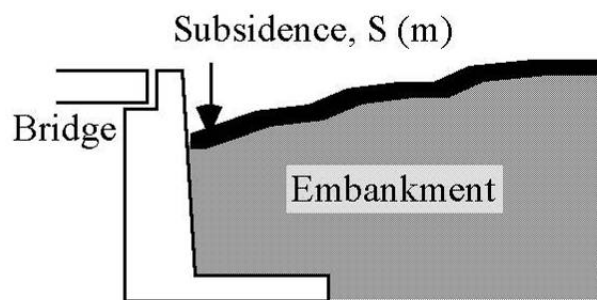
Subsidence of embankment adjacent to bridge abutment
